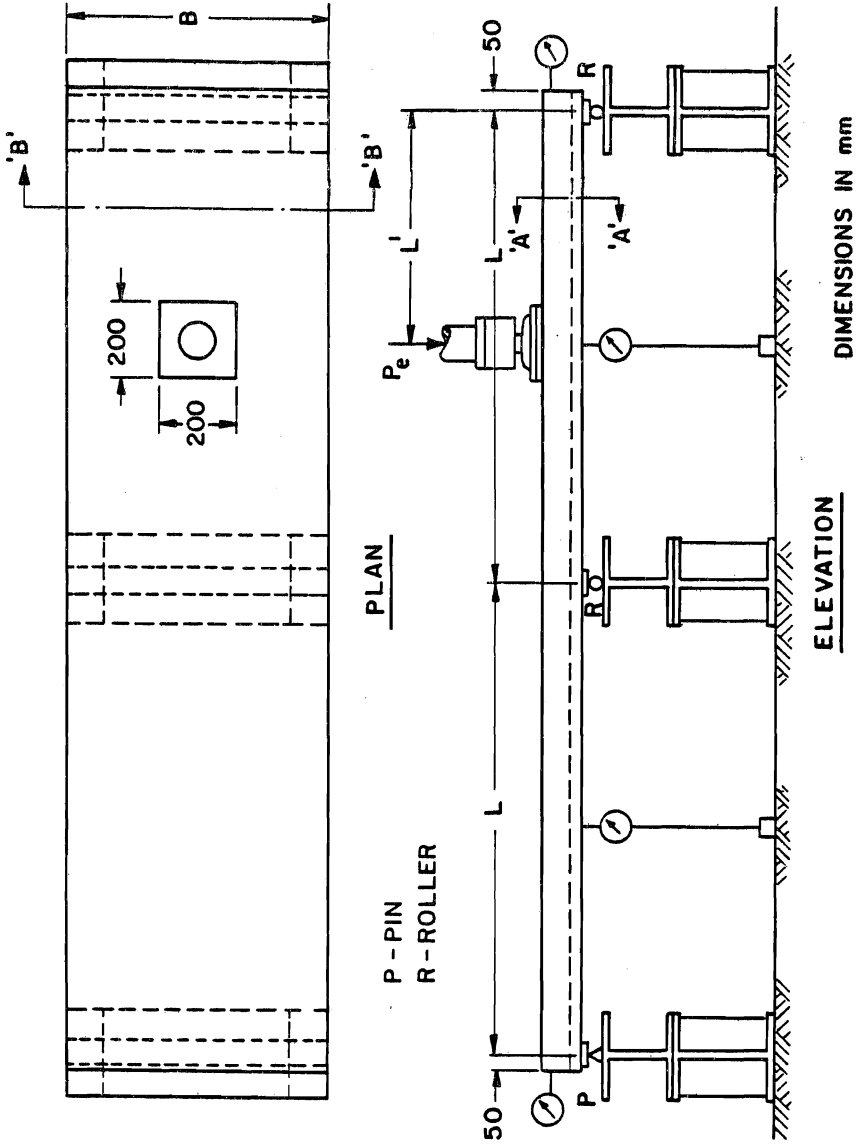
Typical Test Set-up for Double Span. (See Fig. 4 for Sections A-A and B-B).
